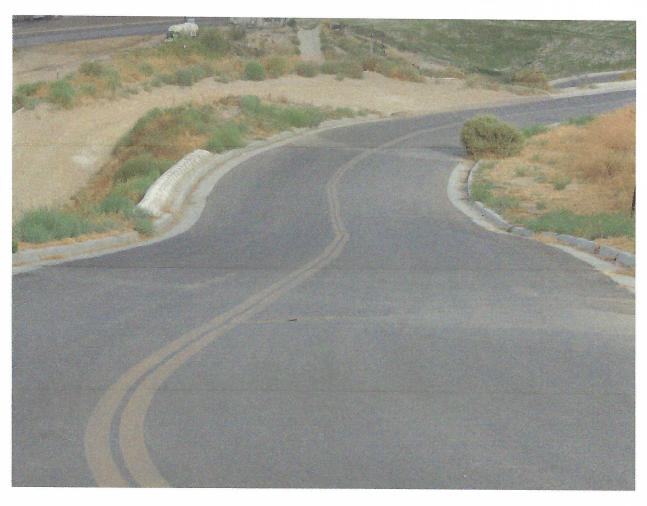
Slight horizontal offset (yellow lines) at second crack on access road to the administration pad.
